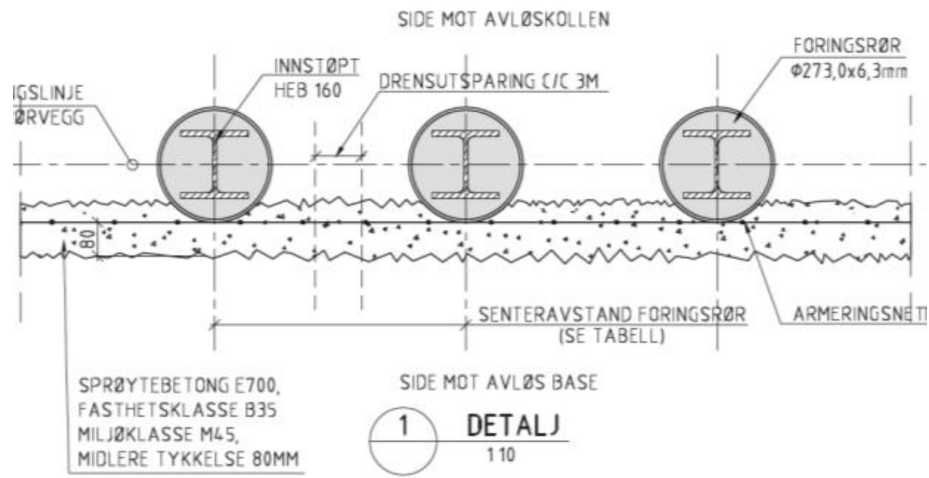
Cross section of the pile wall at Avløs station, taken from [30]
